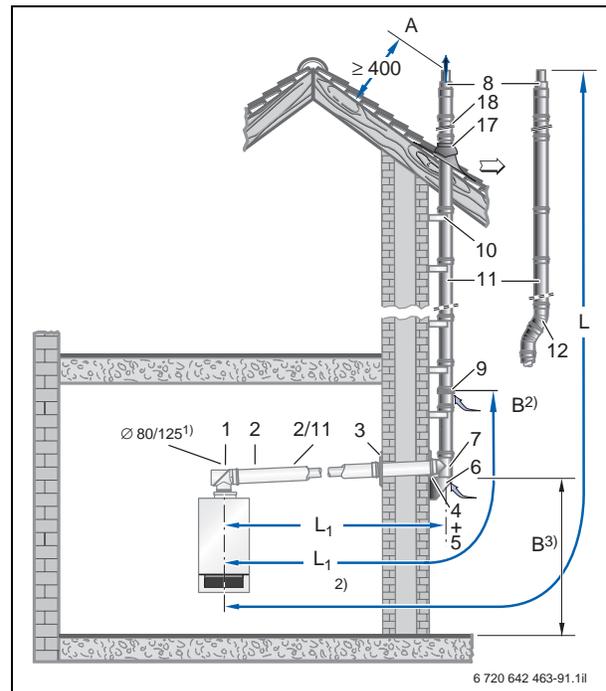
Installation version with the GAF-K set (dim. in mm)
